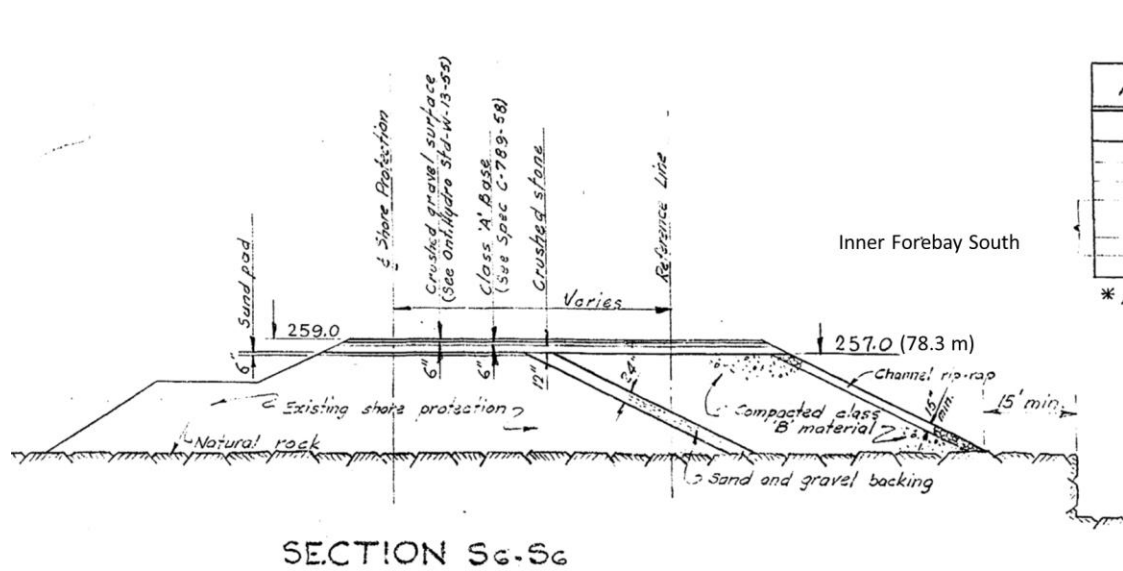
Cross-section at Intake Forebay/Channel South from historical drawing (NA21-FY-16-1_R06)
